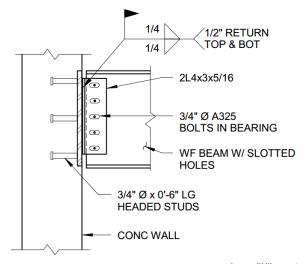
Beam -to-Wall Connection (Sheet S-1.05 Detail 12)
